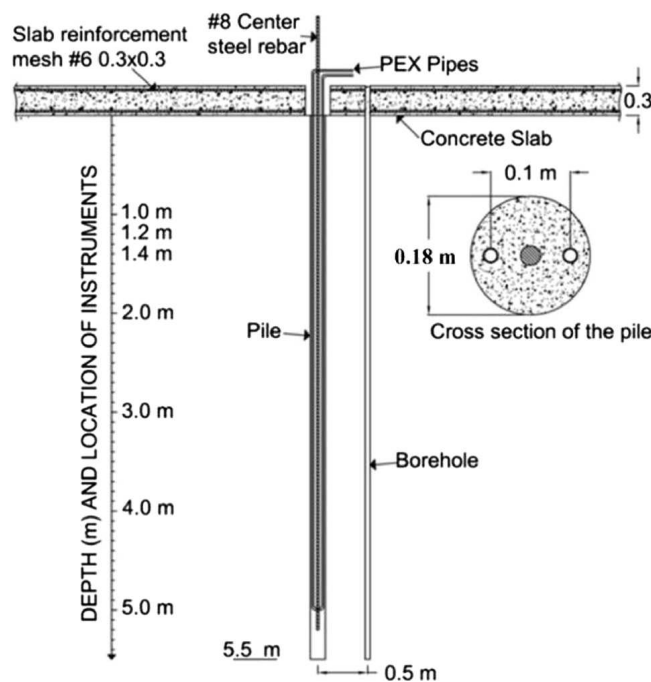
Cross section and plan view of the pile in Texas experiment (Akrouch *et al.*, 2014)
